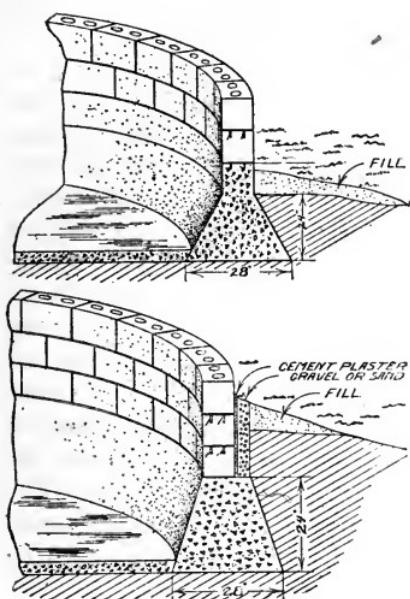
Two types of foundation for cement block silos.—Courtesy Nebraska Station.
